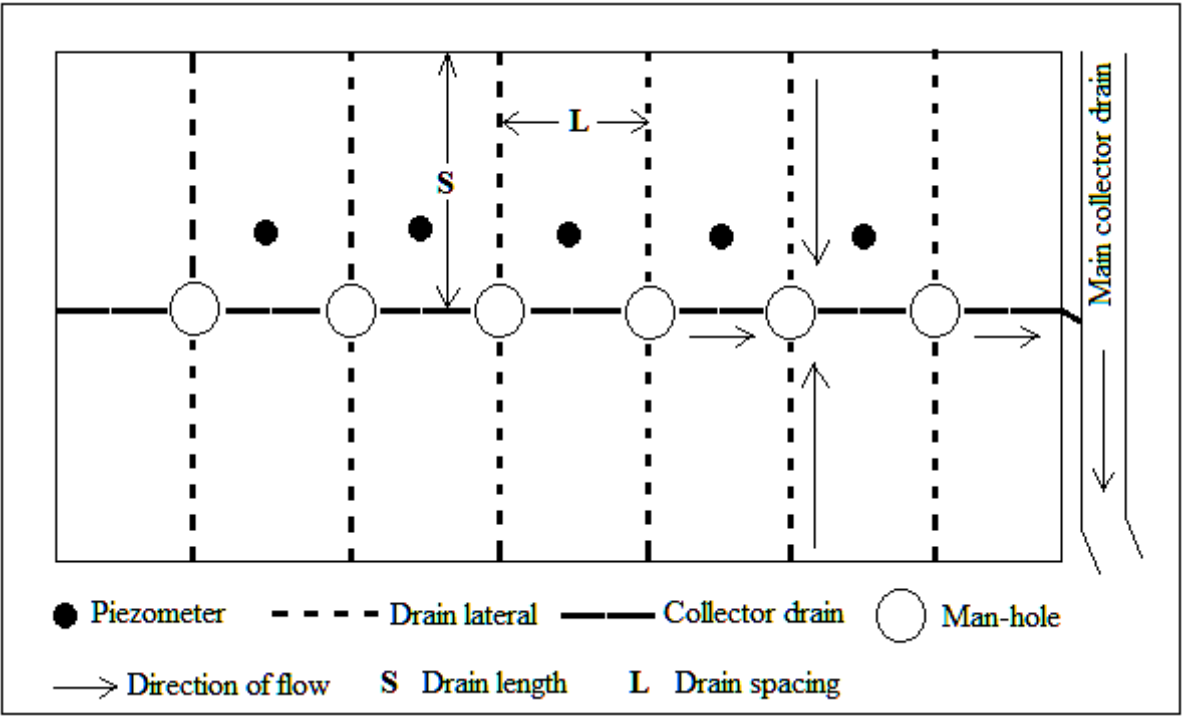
A schematic of the layout of piezometers at mid-drain spacing
